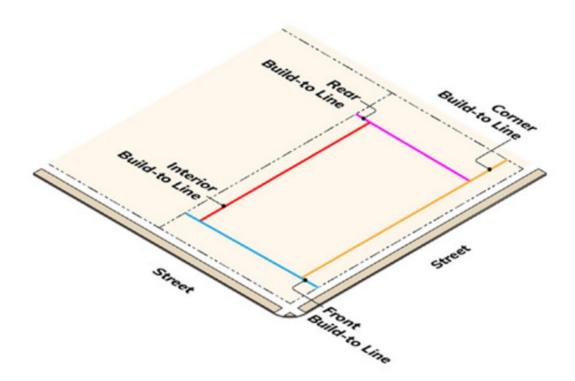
Illustration depicting the Front Build-To Line, Interior Build-To Line, Corner Side Build-To Line, and Build-To Line on a lot.
